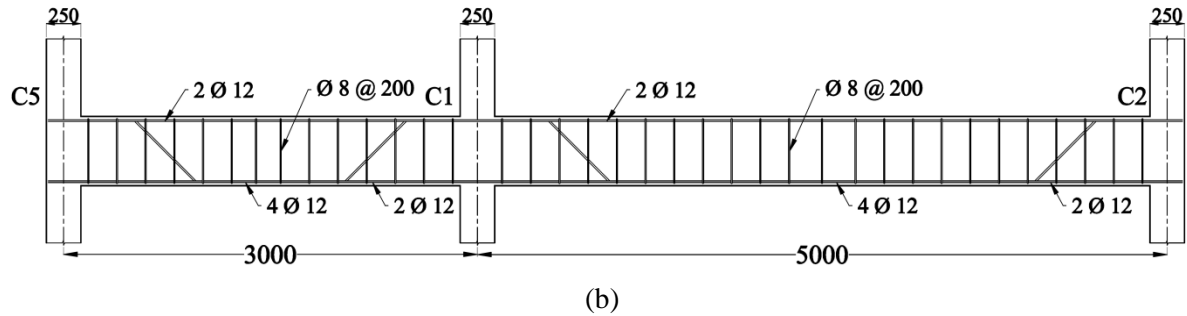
Typical longitudinal steel reinforcements of a beam along the columns C5, C1, and C2 (all dimensions are in millimetres).
